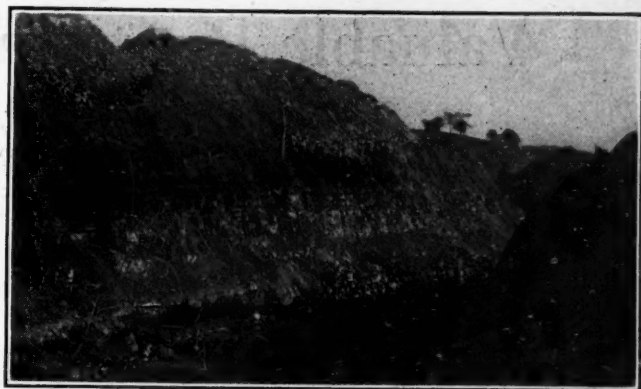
CUT COMPLETED AND SHOVEL REMOVED
